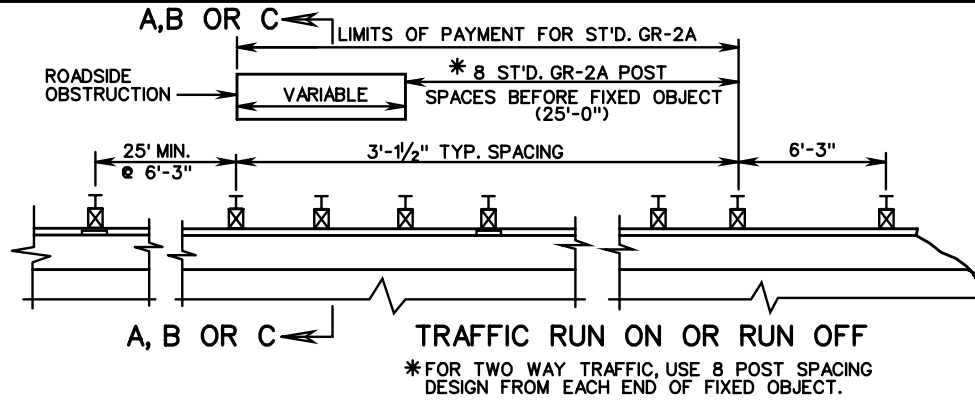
DETAIL OF GUARDRAIL AT DUAL BRIDGES
